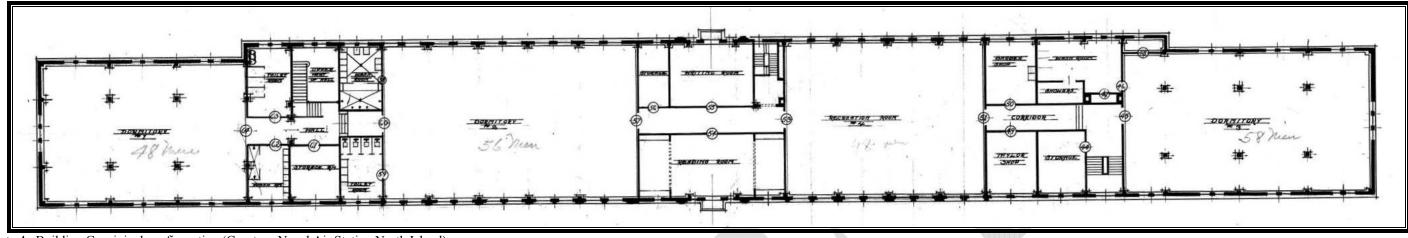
Building G, original configuration (Courtesy Naval Air Station North Island)
